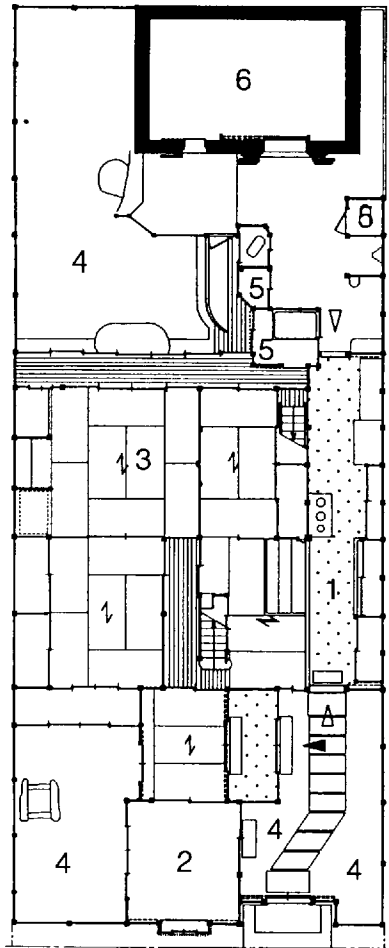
PLAN OF THE FUKUYAMA HOUSE
